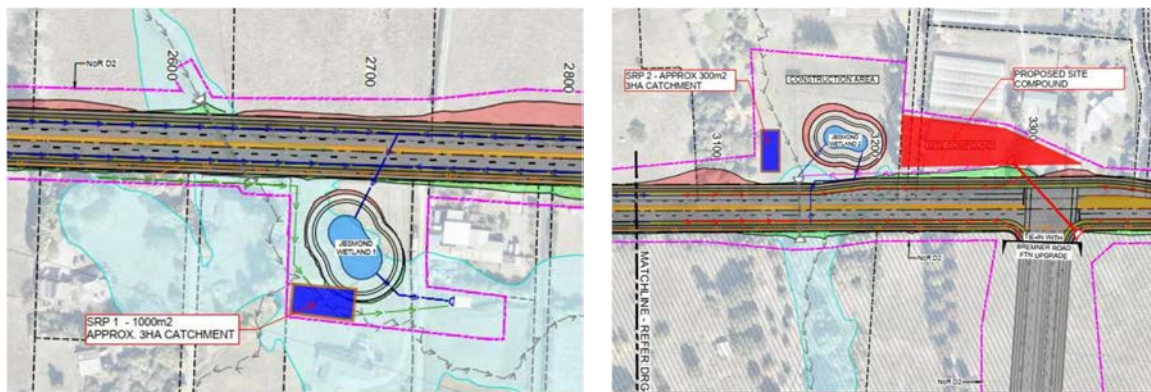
Indicative Construction, Compounds, Laydowns for Waihoehoe Road West
